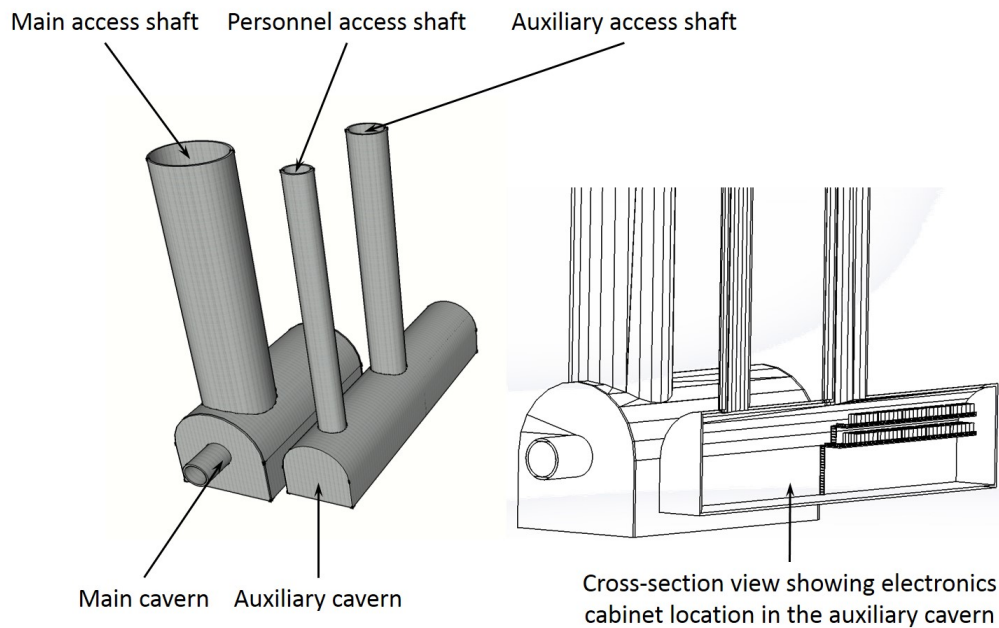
The CEPC detector underground cavern. Left: relative positions of main cavern, auxiliary cavern, main access shaft, personnel access shaft and auxiliary access shaft. Right: cross-section view showing electronics cabinet location in the auxiliary cavern.
